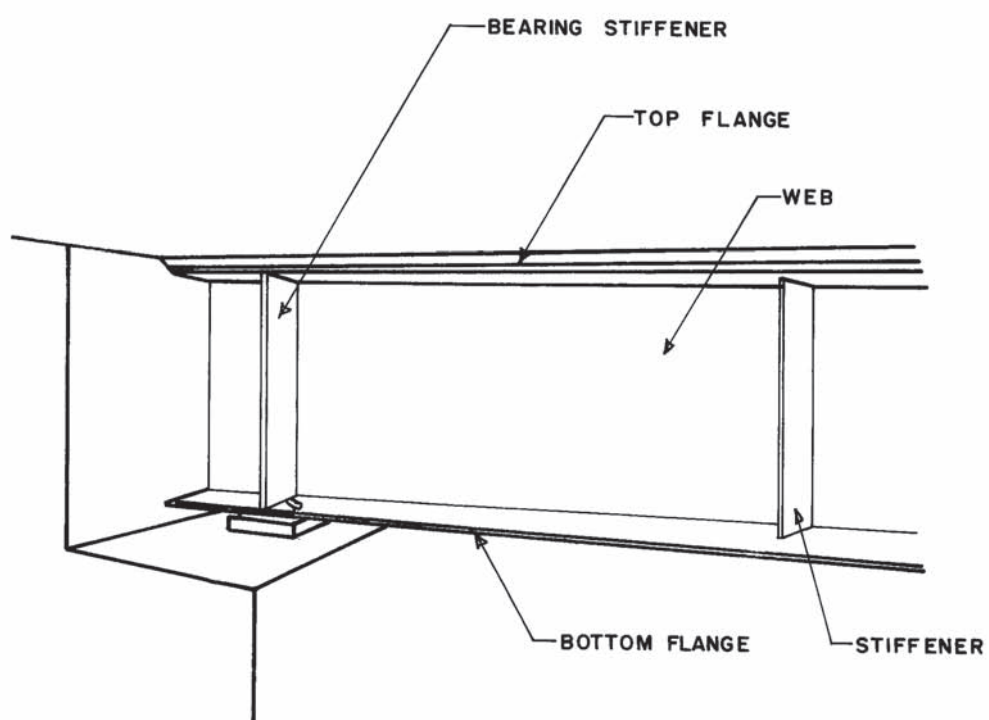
STEEL GIRDERS AND BRACINGS
